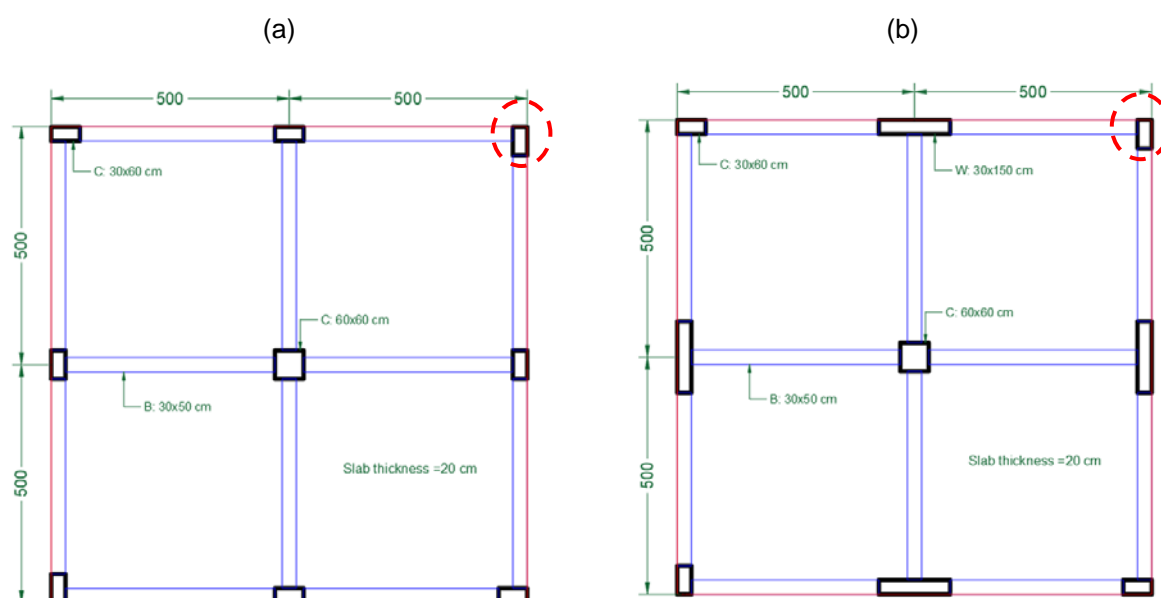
Configuration of (a) building frame system and (b) shear wall system.
